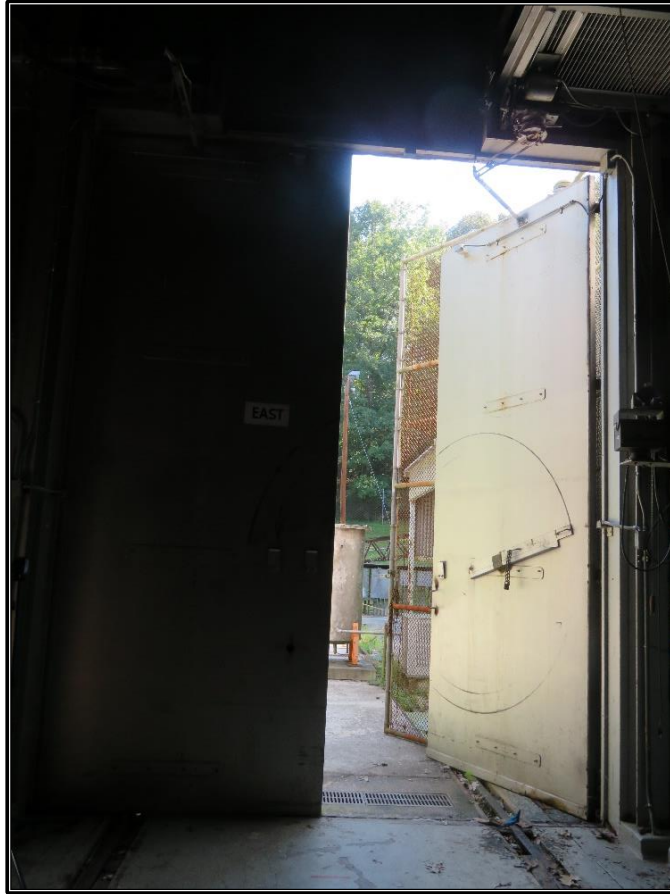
Large double doors located on the east wall of Building 7709, looking east.
